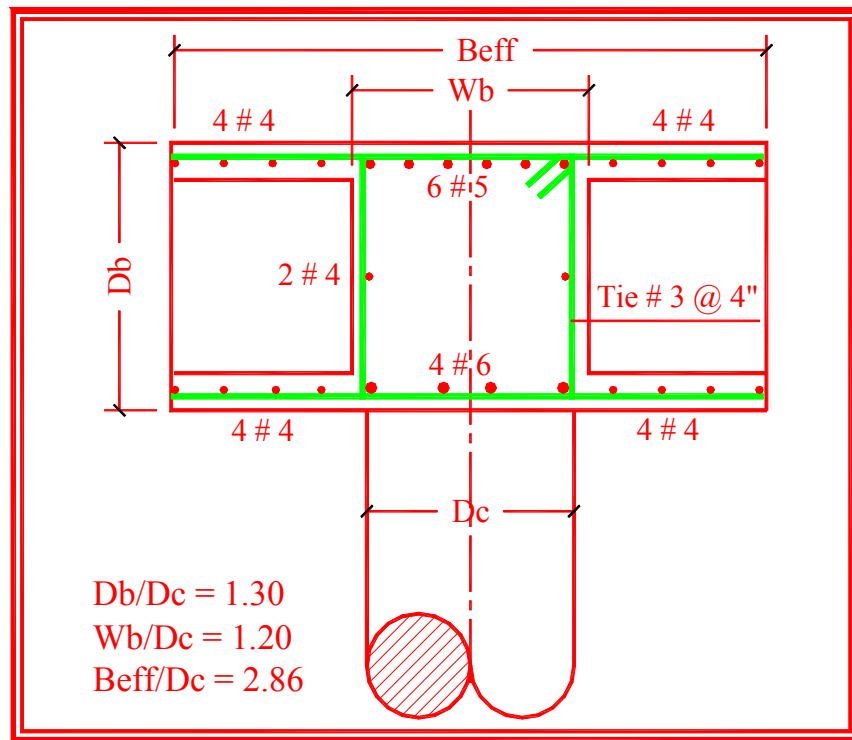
Beam-Column Joint Proportions in Two-Column Bent
